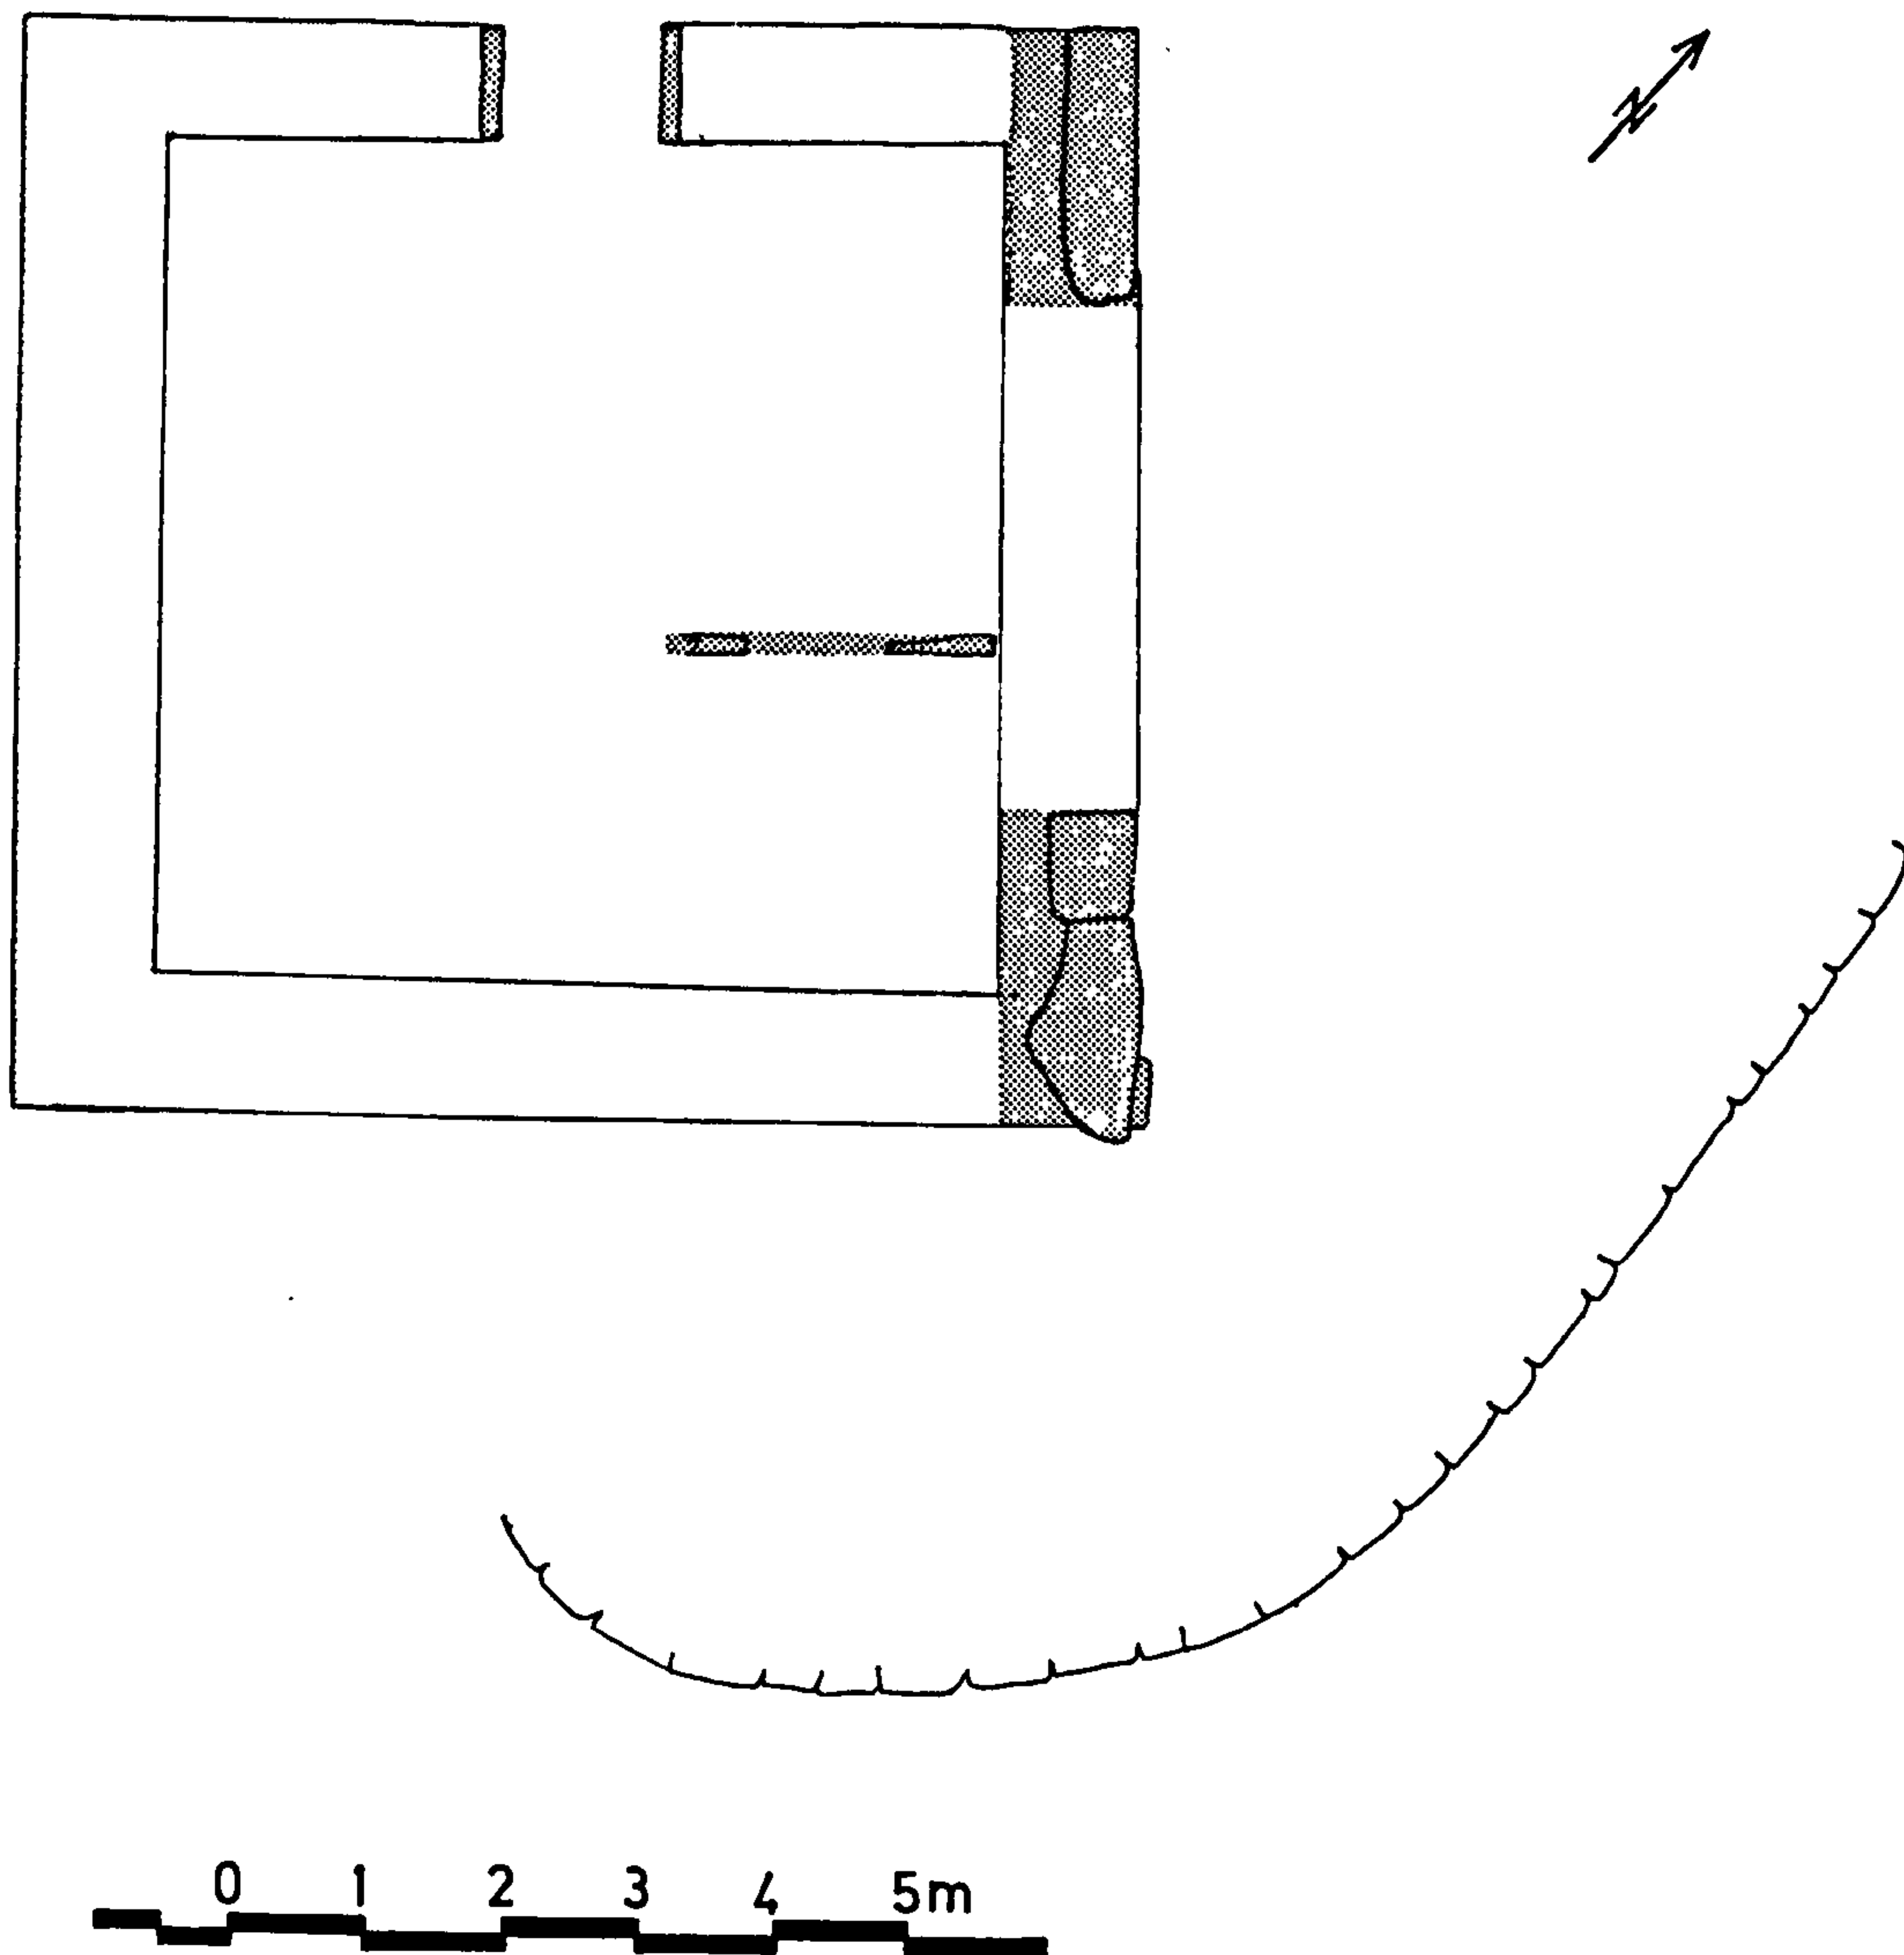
TOKELI: ground plan of the tower and the later terrace wall.
